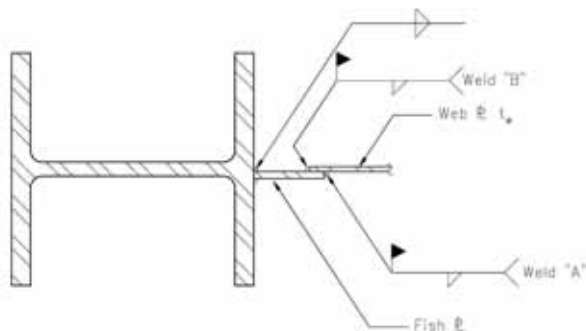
Detail of a fillet-welded web-plate connection.
